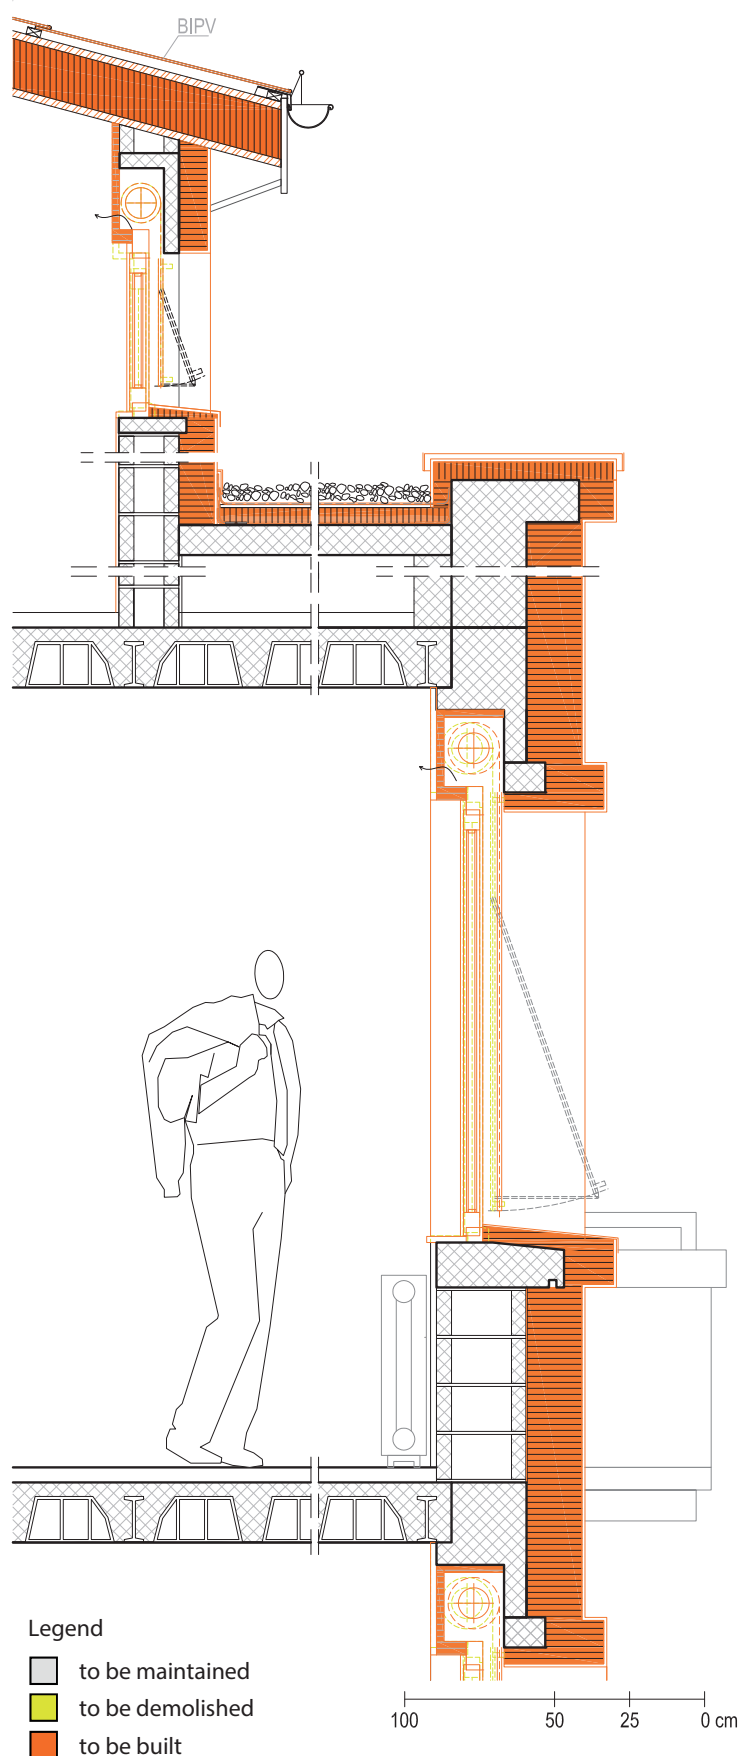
Façade constructive detail, S2 – BIPV Renovation, Archetype 2.
